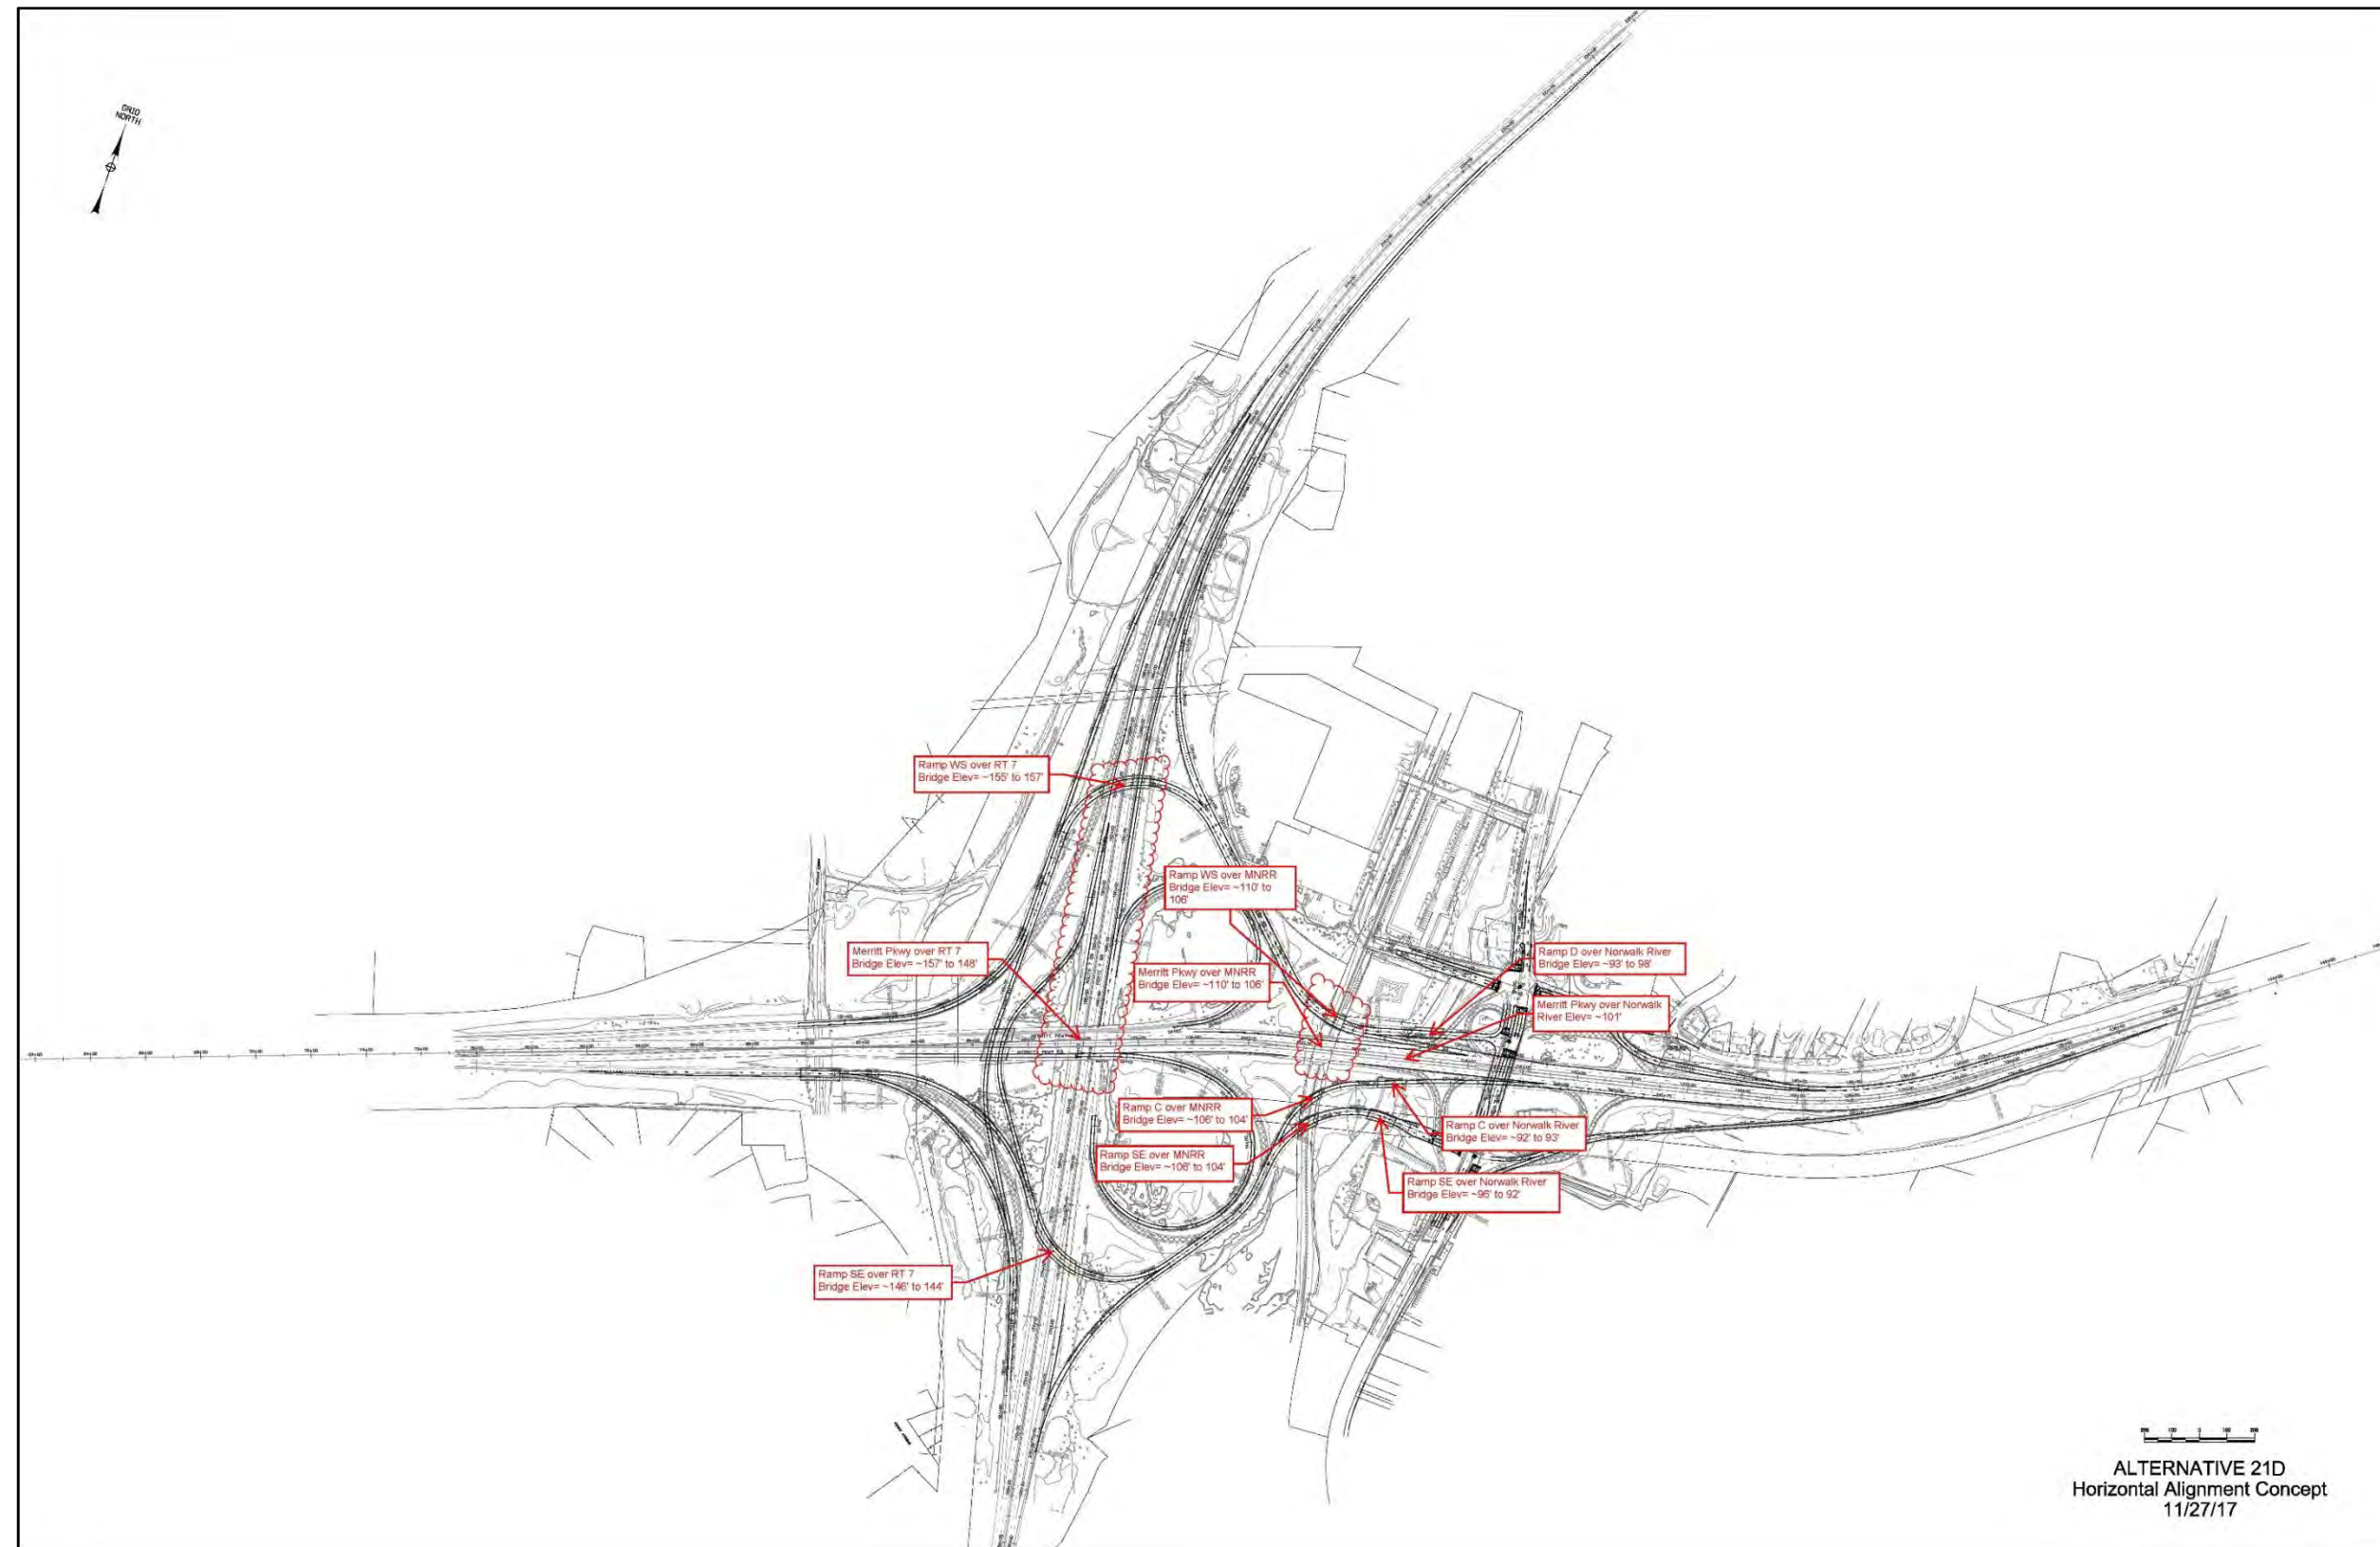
Project conceptual plans depicting elevation of Alternative 21D.
